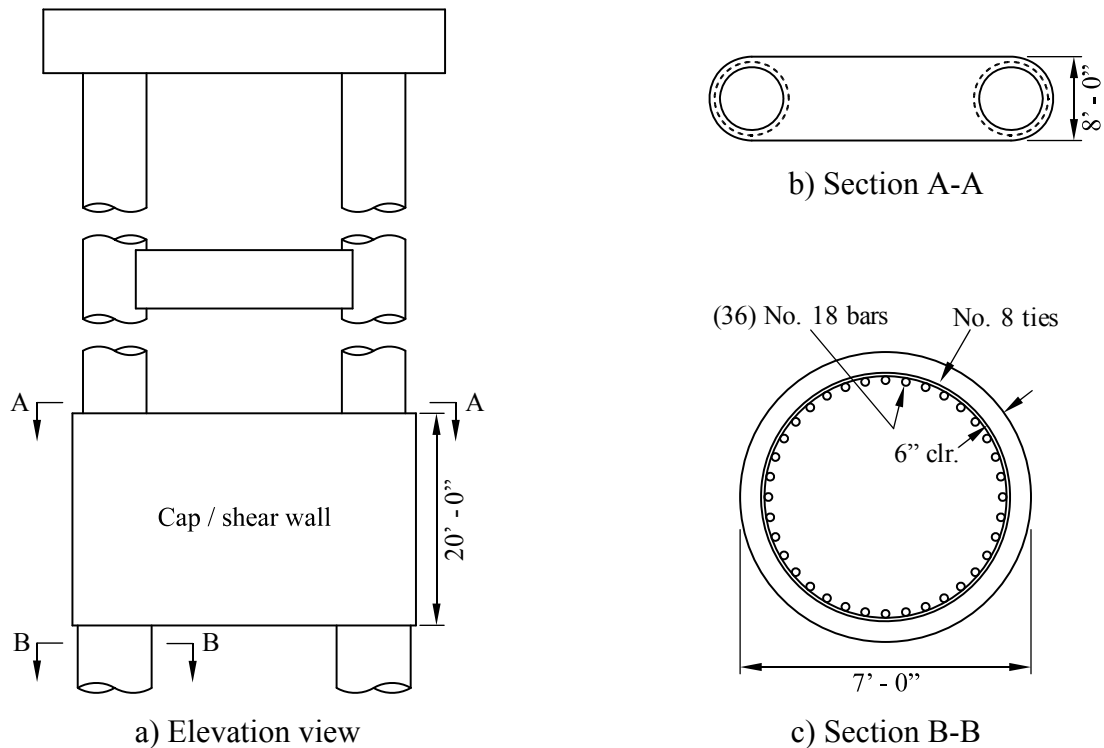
LA-1 Bridge alternative design with drilled shaft foundation: piers 96 – 97
